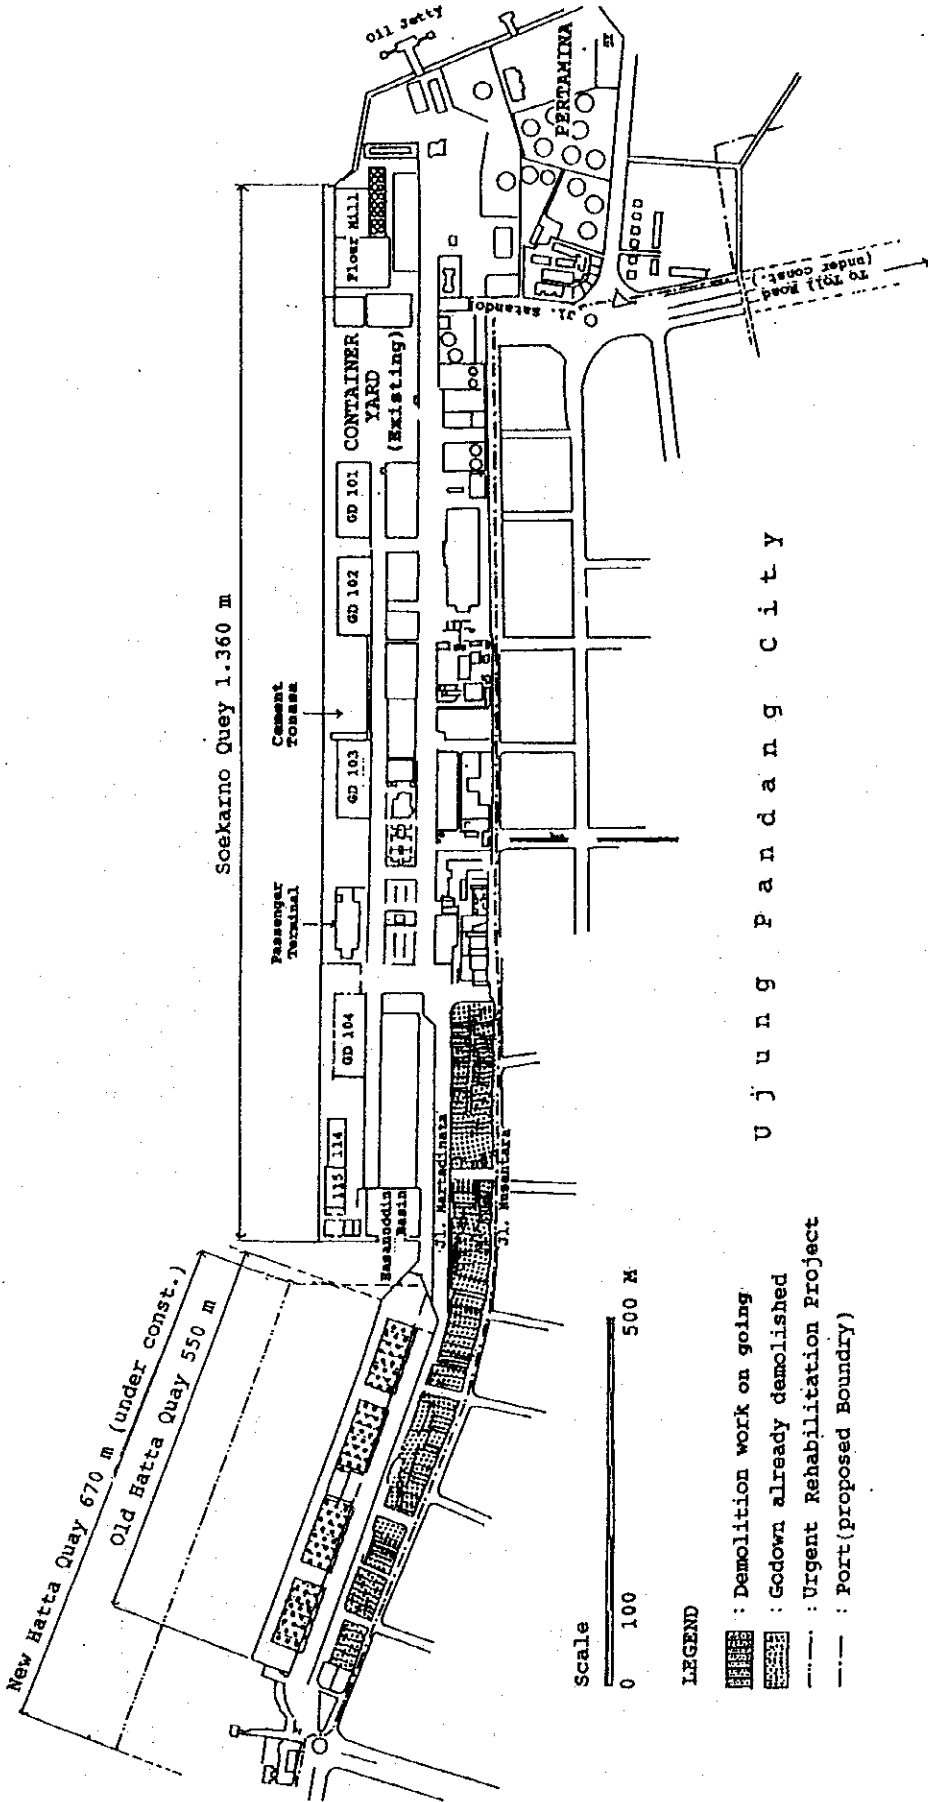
General Layout Plan of Ujung Pandang Port (Existing)
